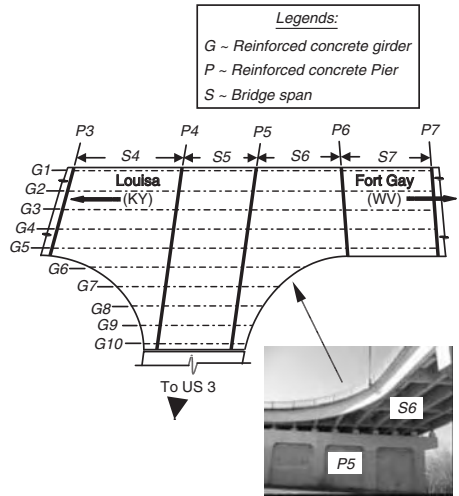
Middle reinforced concrete span of the Louisa-Fort Gay Bridge.
